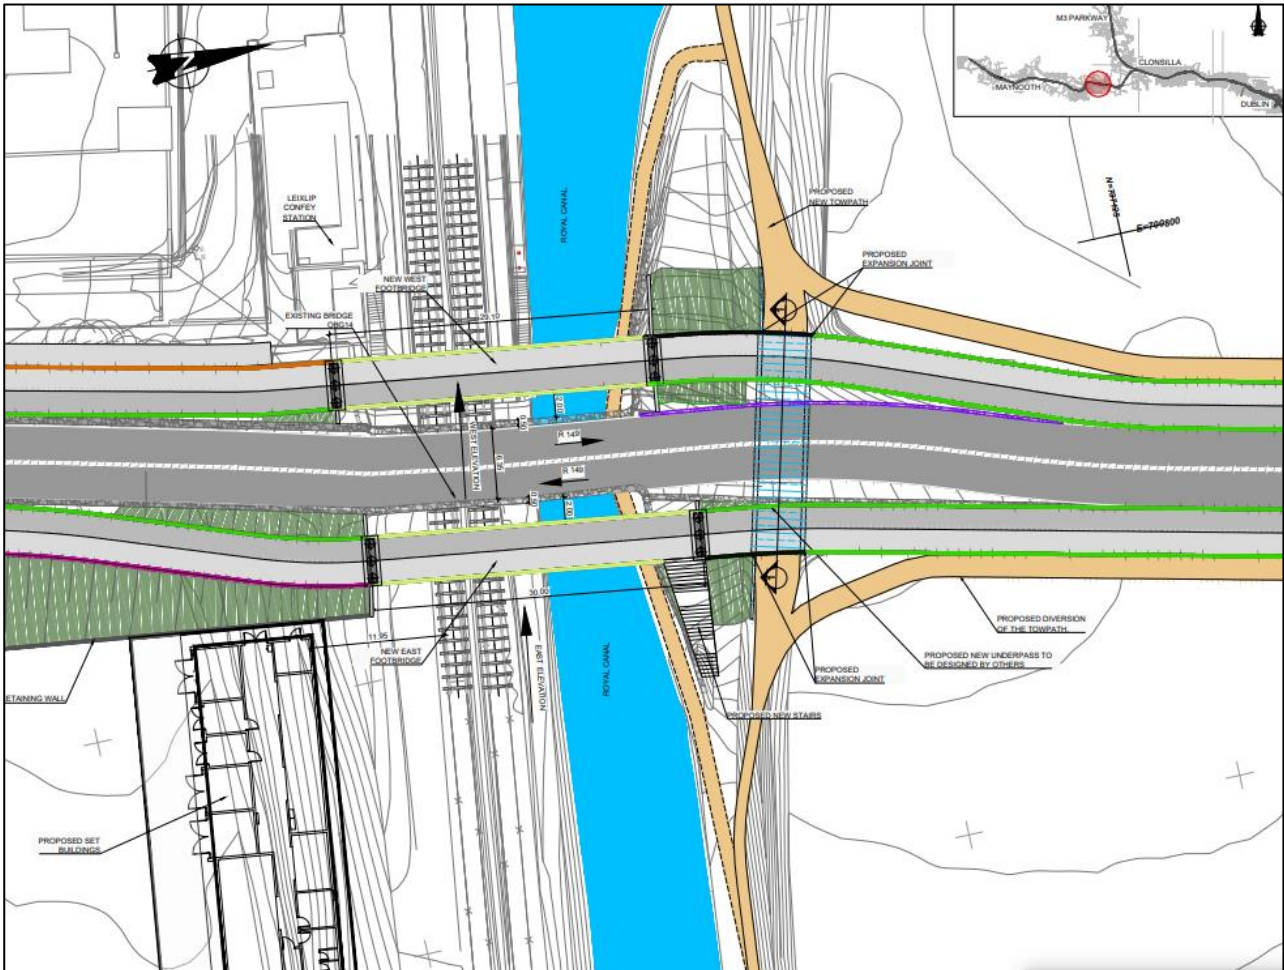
Proposed Cope Bridge Upgrade by Irish Rail as part of DART + West upgrade (Extract from Dart+ West Railway Order)
